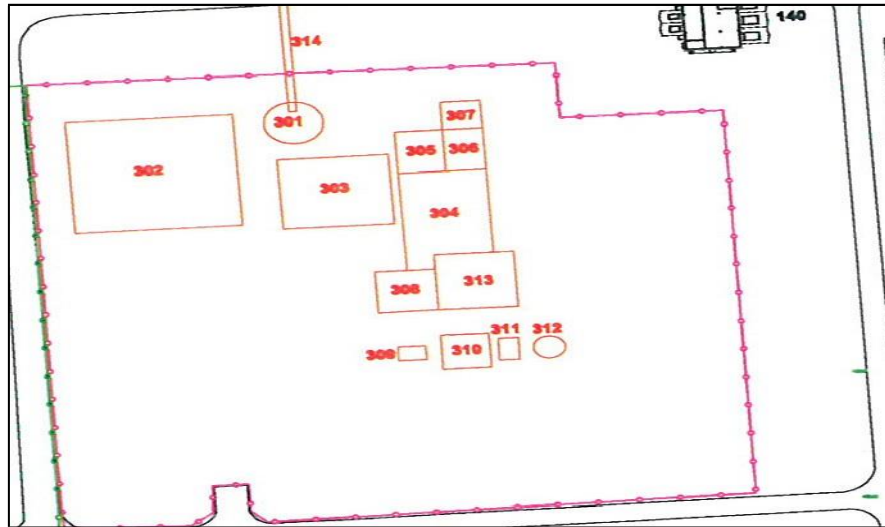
Details on INCINERATOR SITE LAYOUT
